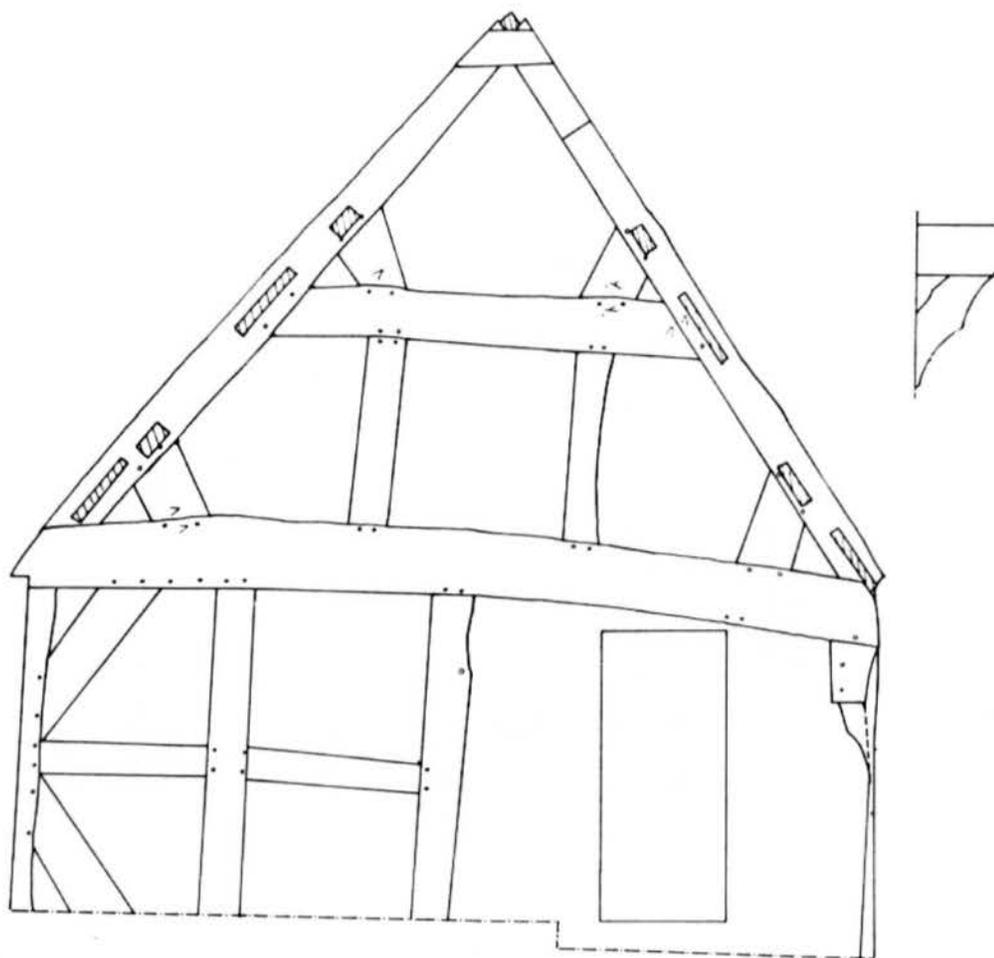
Roof. Truss No.3 [Archive] - J. Sterenberg et al.
